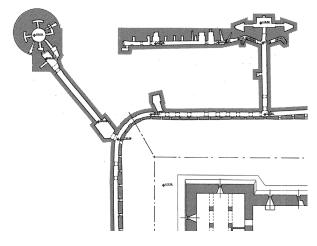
First basement floor plan of the studied area. Some rooms of the Torre della Colubrina (left) and part of the Porta del Soccorso (right) are visible
